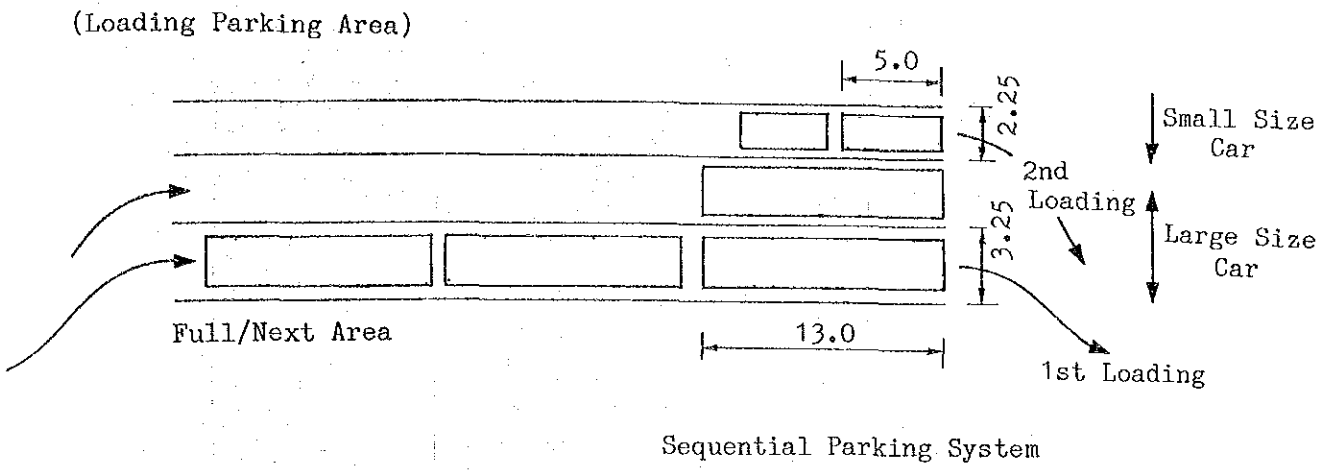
Parking System at the Loading/Waiting Parking Area
